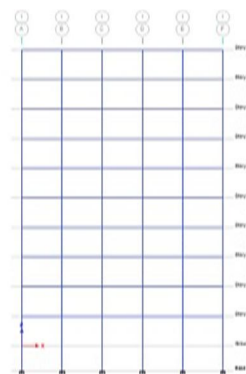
Plan of the Building Selected(AutoCAD v18)
